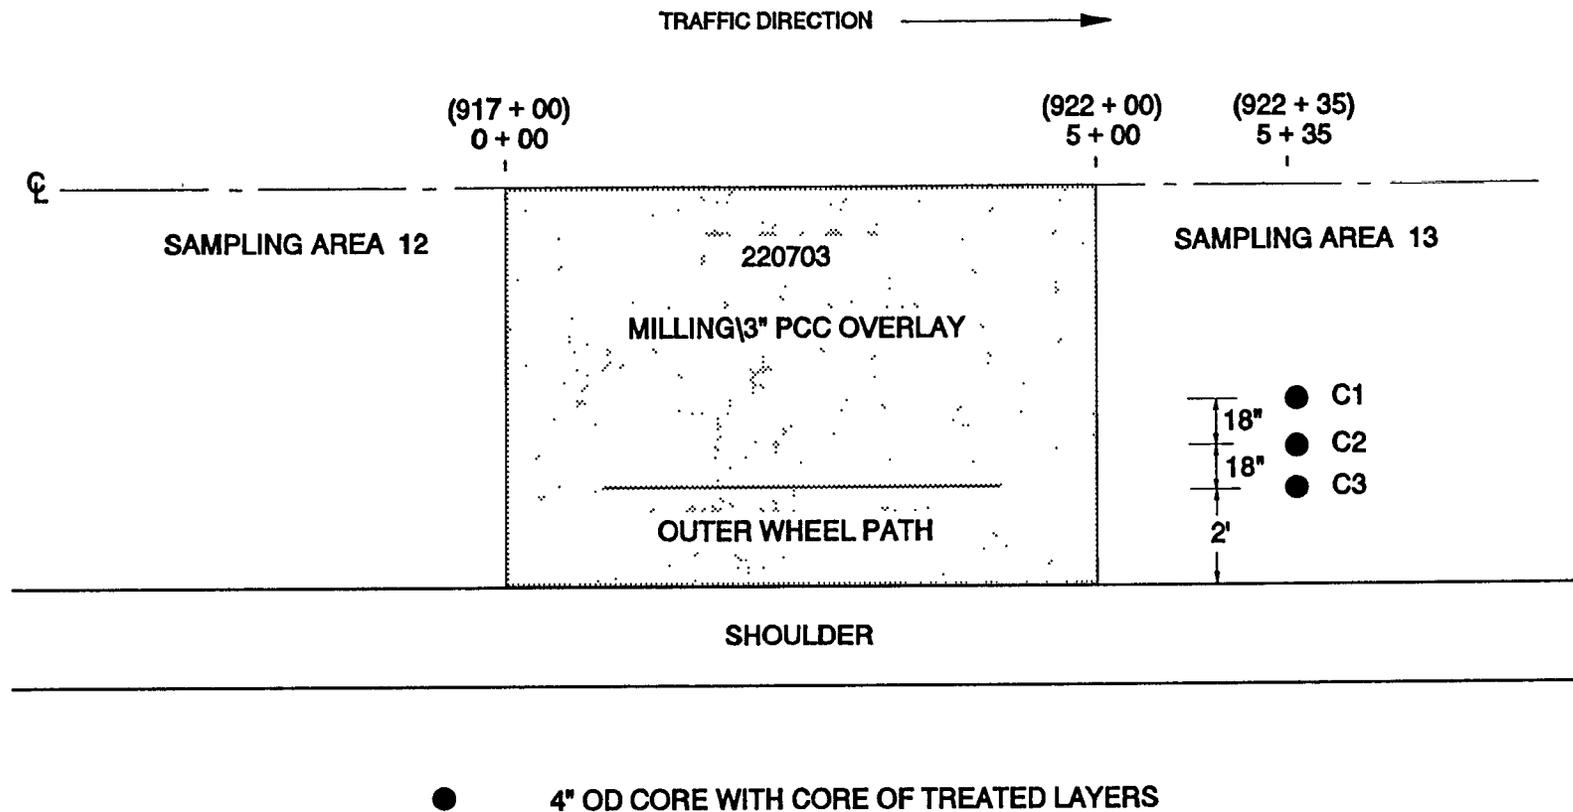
Preconstruction Sampling Area Plan for Louisiana SPS-7
